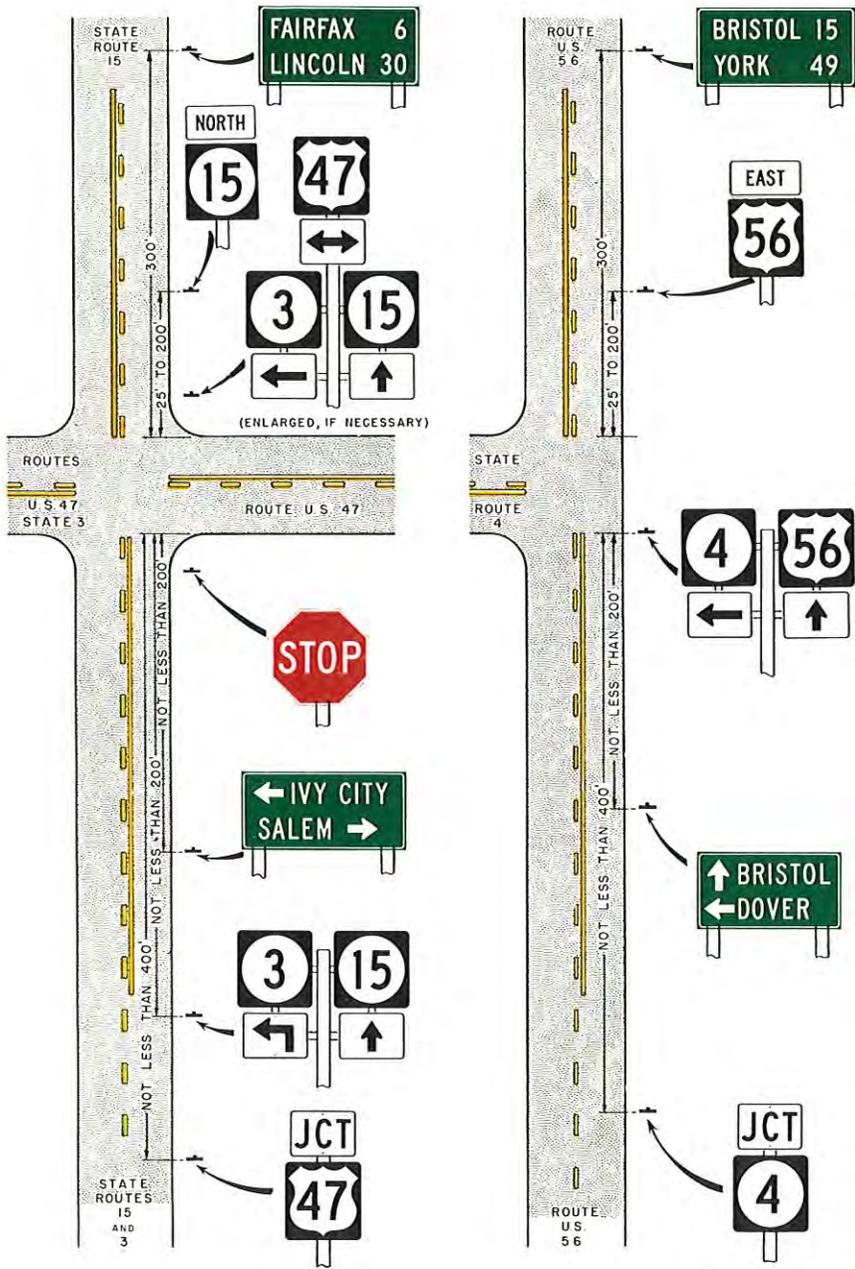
Typical route markings at rural intersections (for one direction of travel only).
